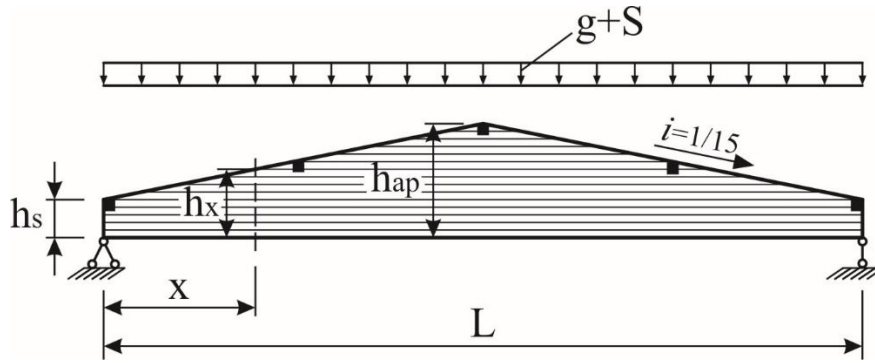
Scheme of beam loading and place of attachment bracing system.
